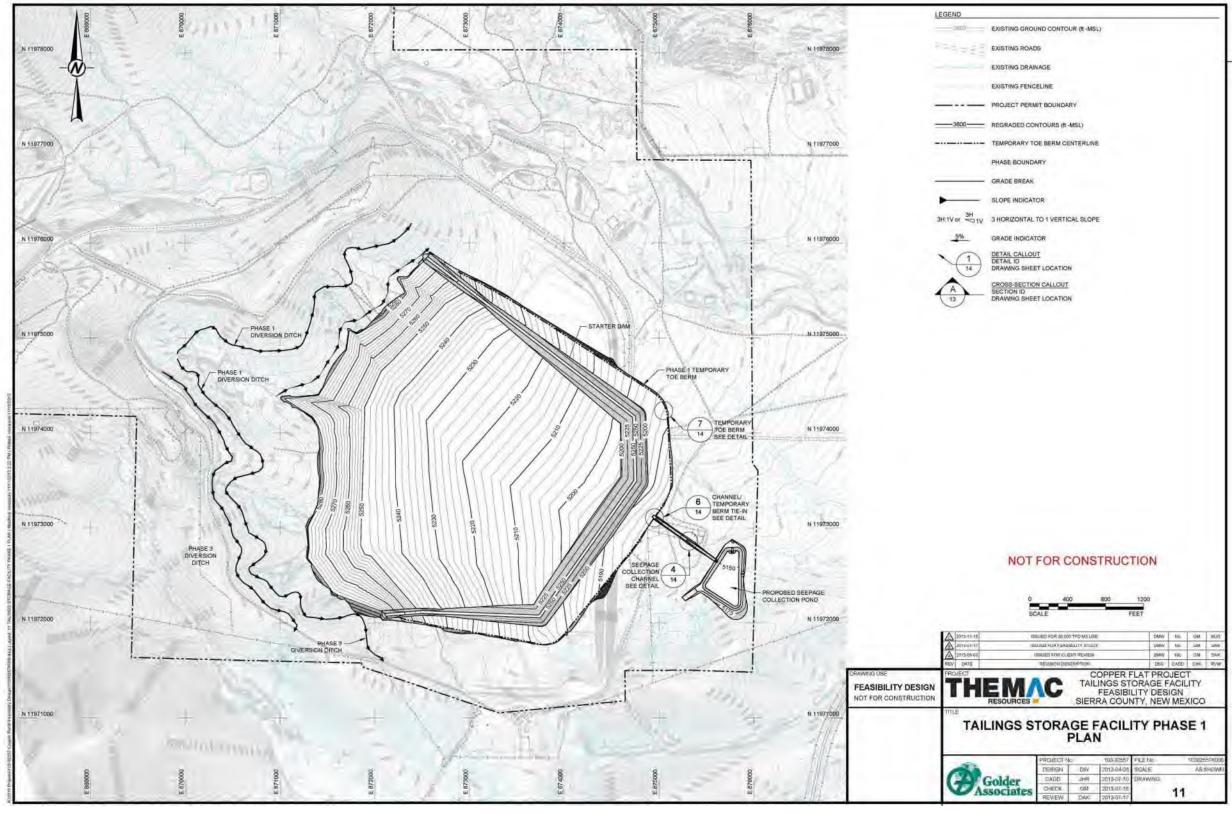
Tailings Storage Facility Grading Plan Phase 1
